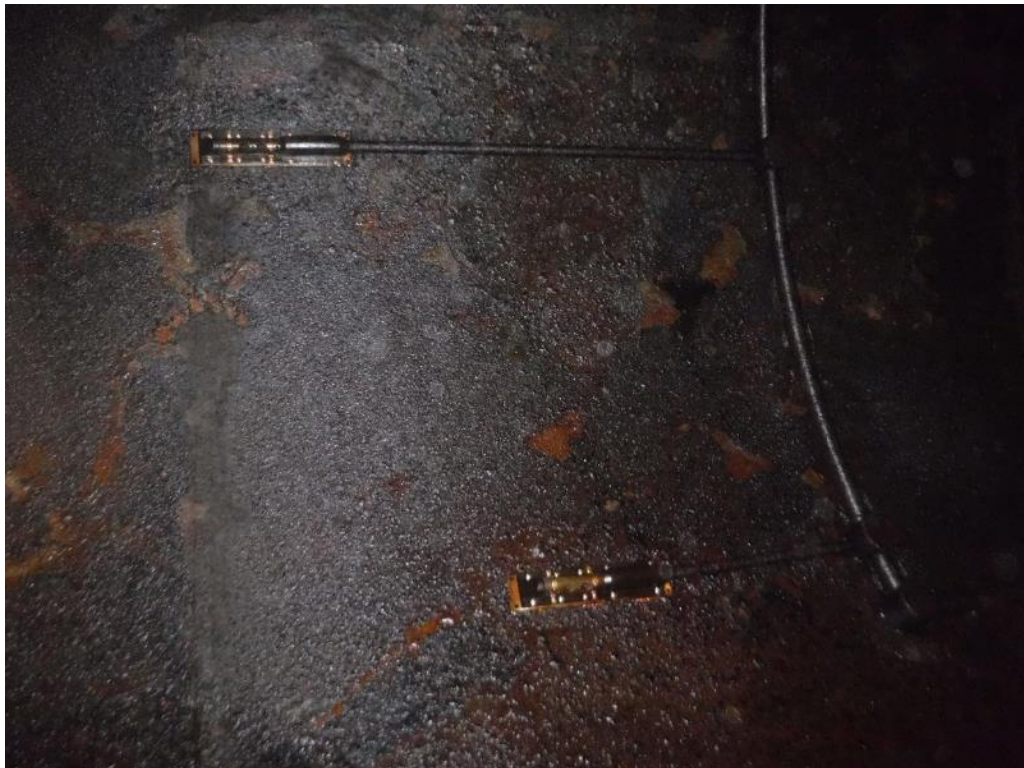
PRESSURE MONITORING AT TOP OF 19 DEGREE SLOPE
